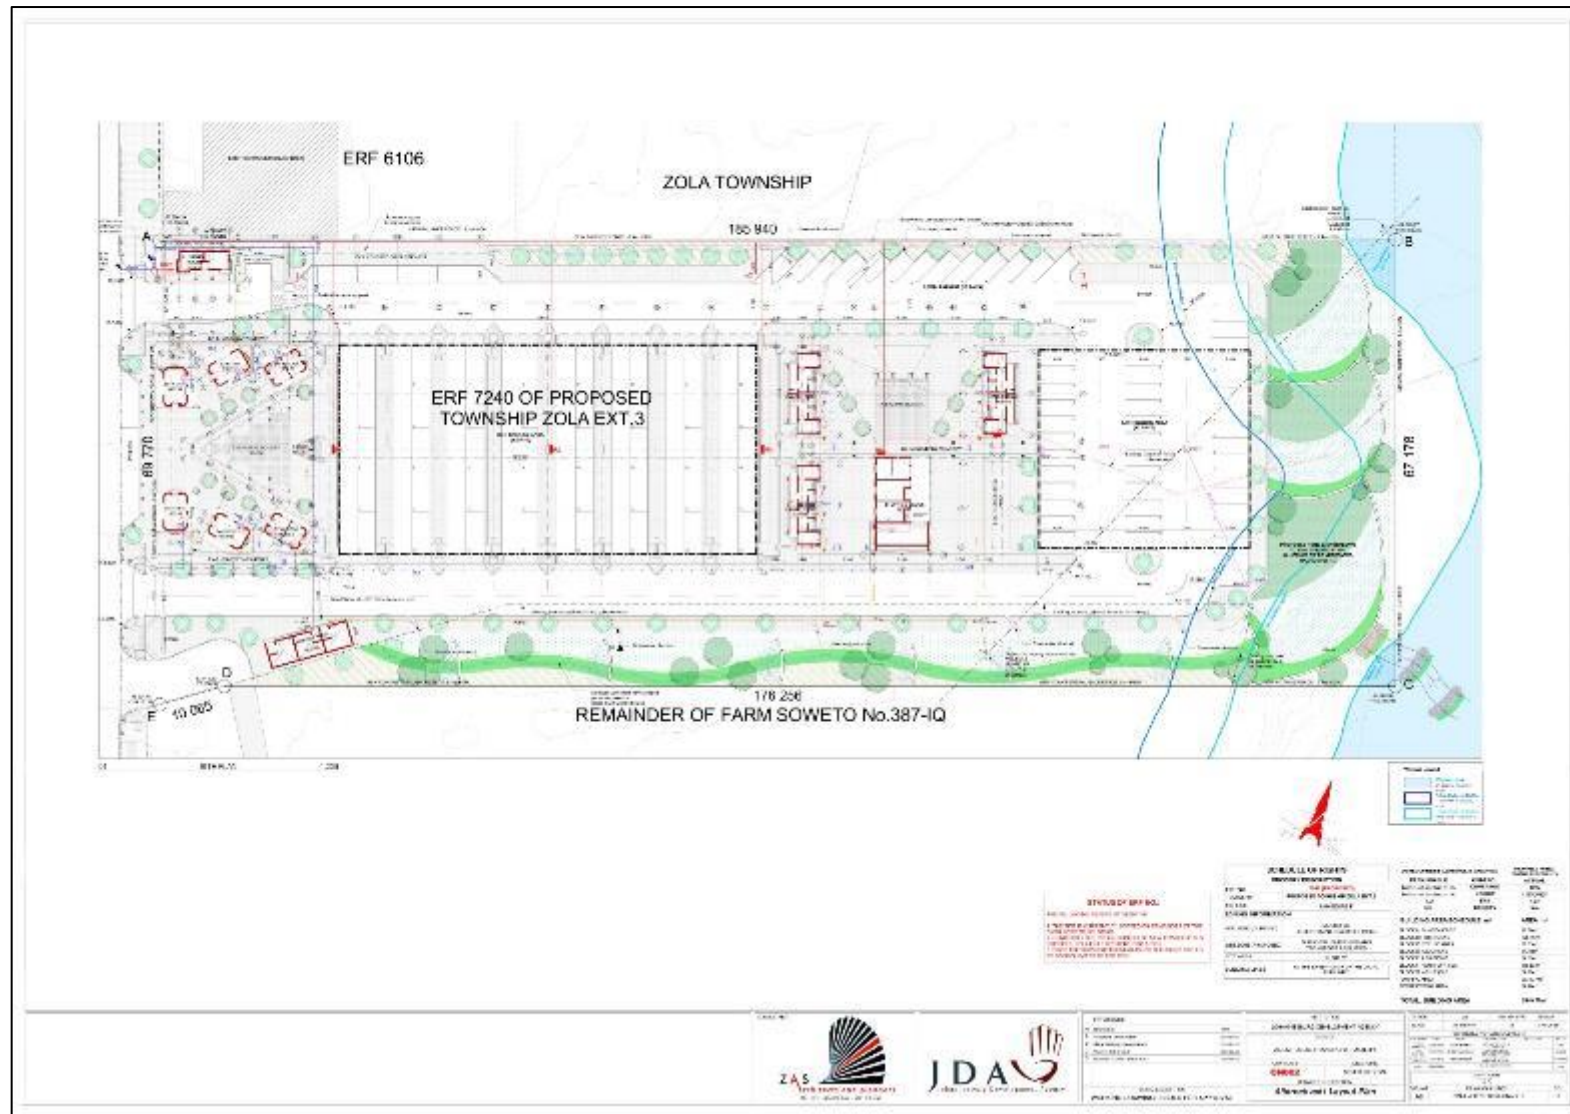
Public transport facility, Zola, site development layout plan for alternative#1 layout proposal (not preferred) in relation to the wetlands.
